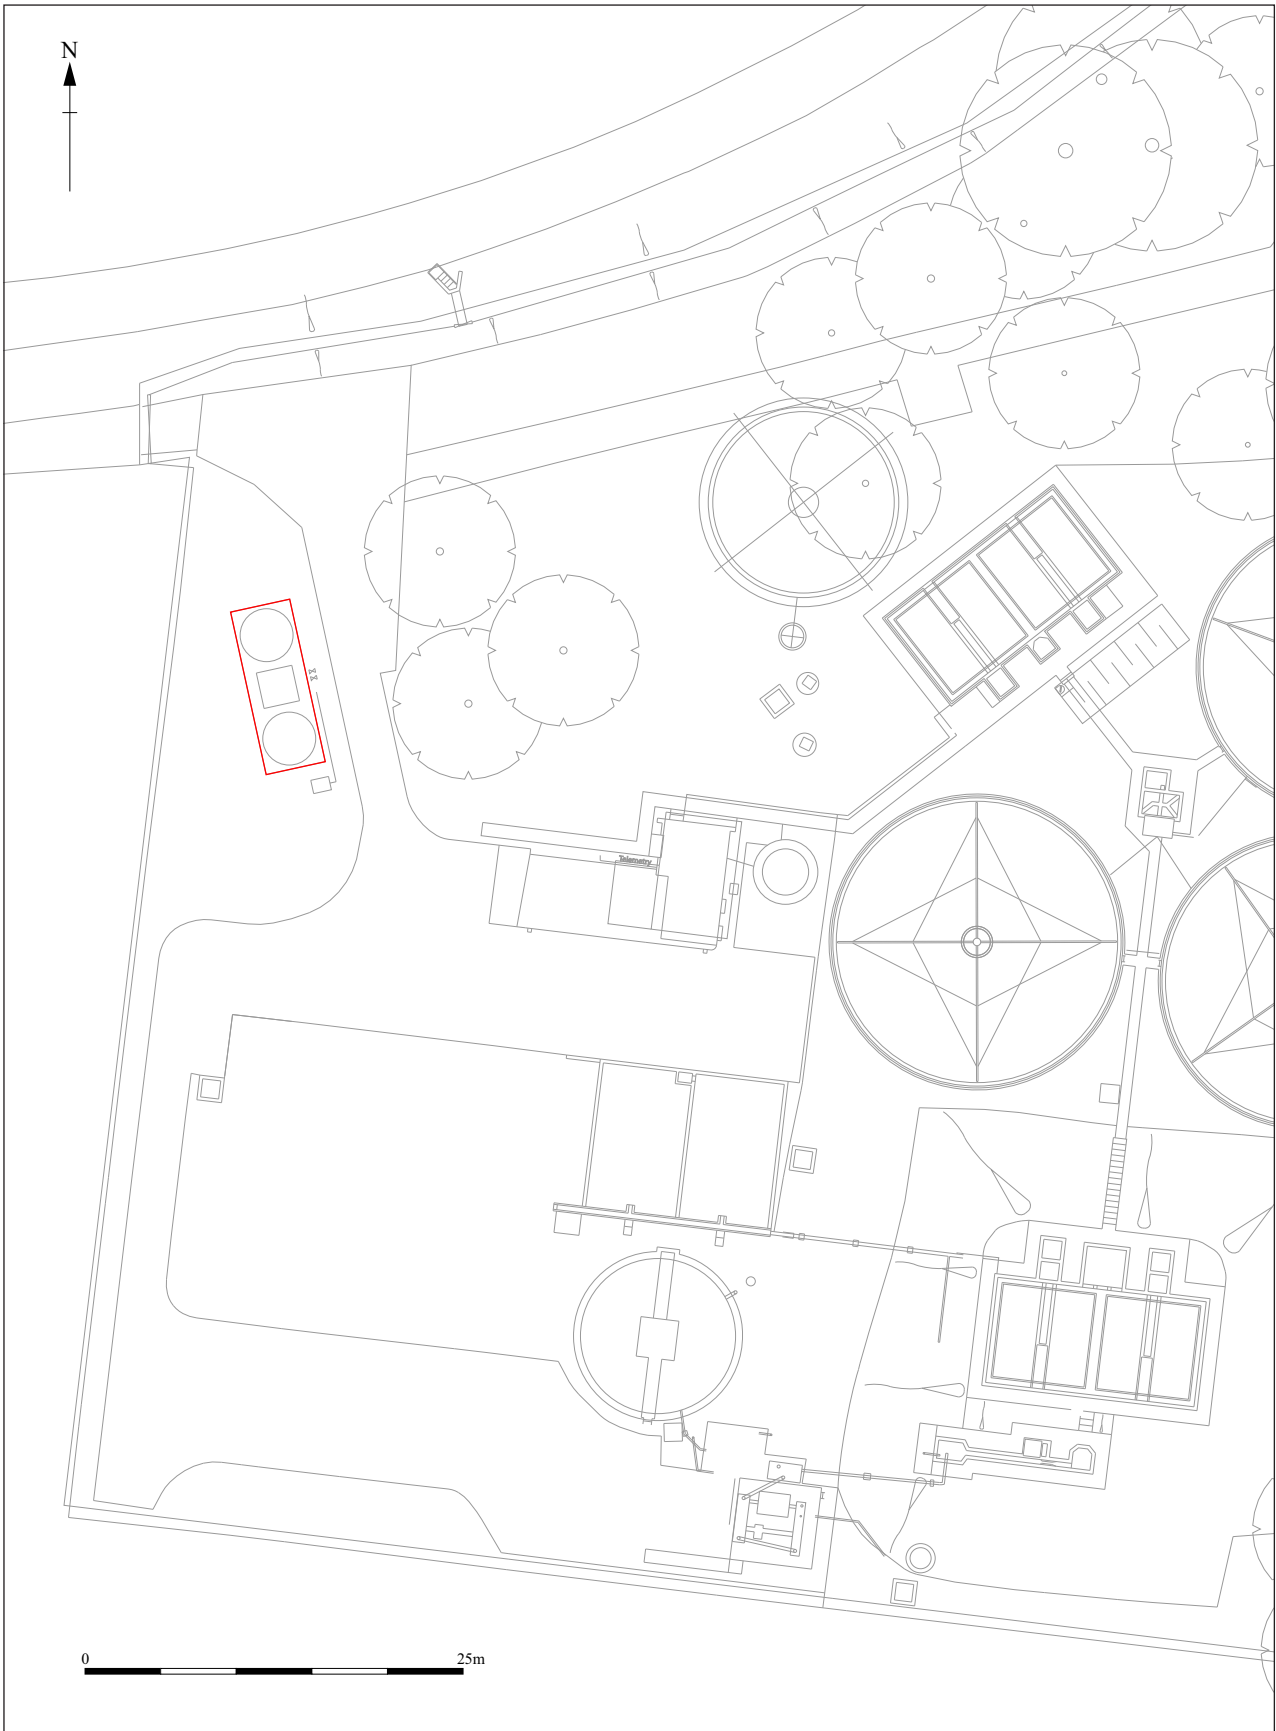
Site plan at 1:500 scale, showing excavated area (red)
